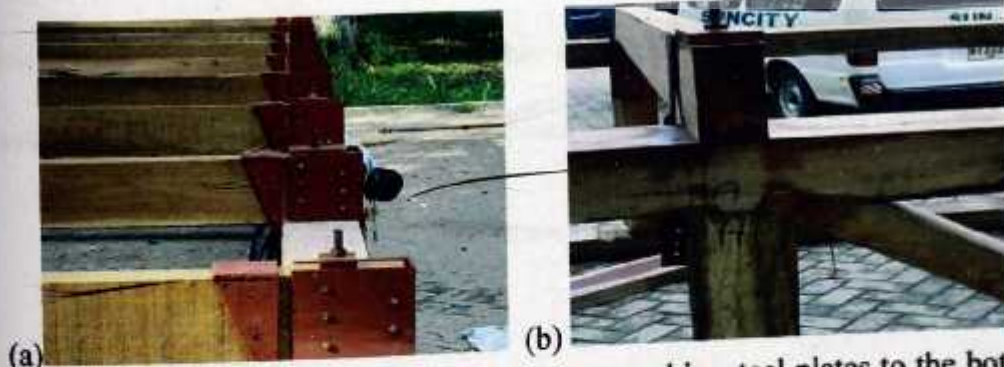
Picture showing crossbeam connected by steel plates to the bottom chord (frame turned upside down)
